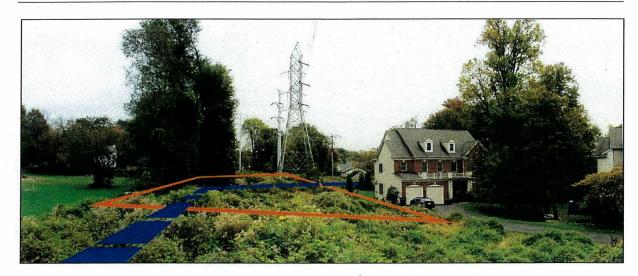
Photograph illustrating the route of Underground Alternative 06 showing temporary HDD workspace east of I-66 and north of Idylwood substation, with no tree removal within 053-0276 (Photo view 15).
